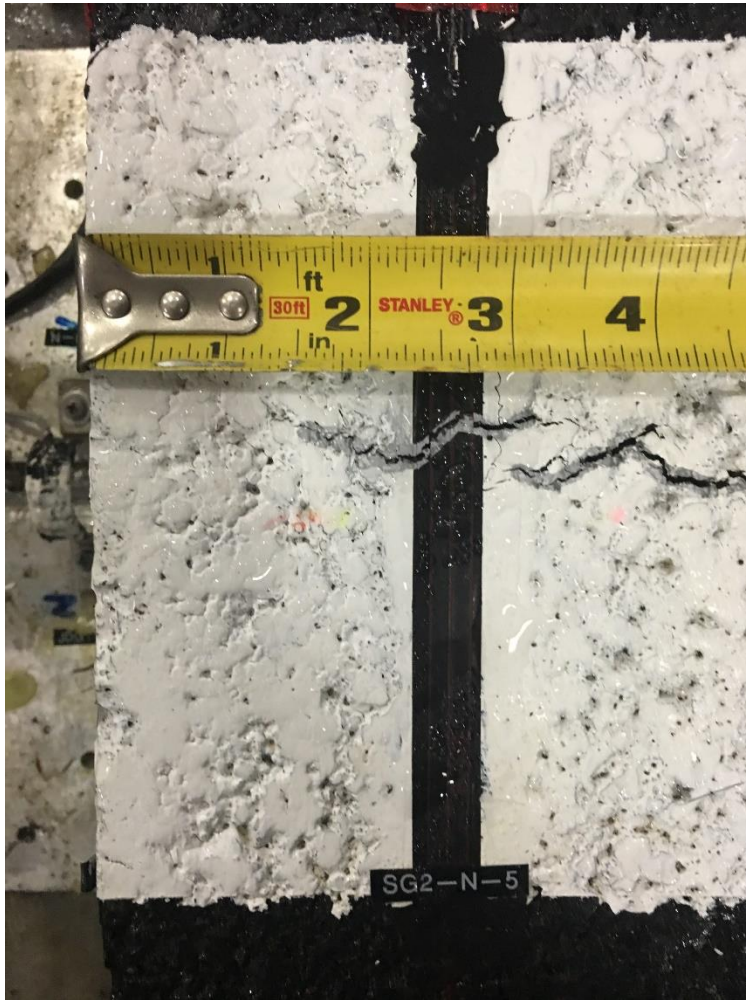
North section surface crack 1.5 inch from the inner vertical edge
